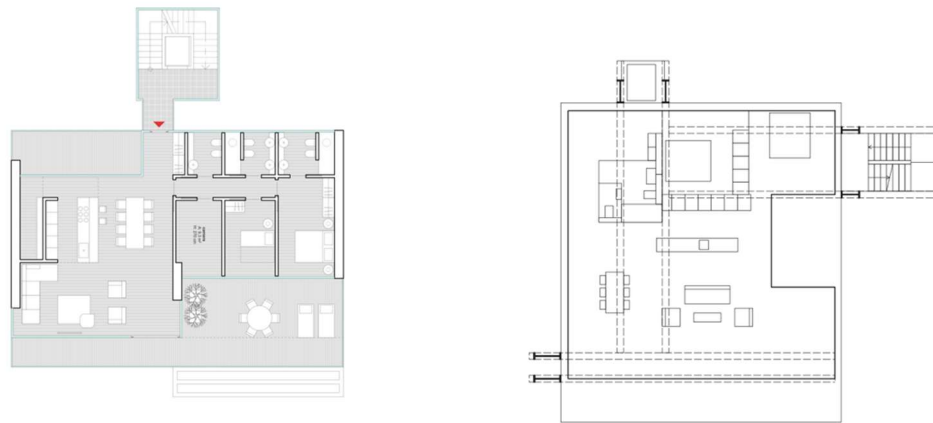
Z10 second floor plan and *House with a missing column* second floor plan.
